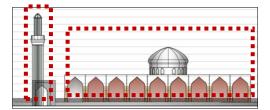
Side Elevation of Rashad Mosque Which is next to House dwellings
